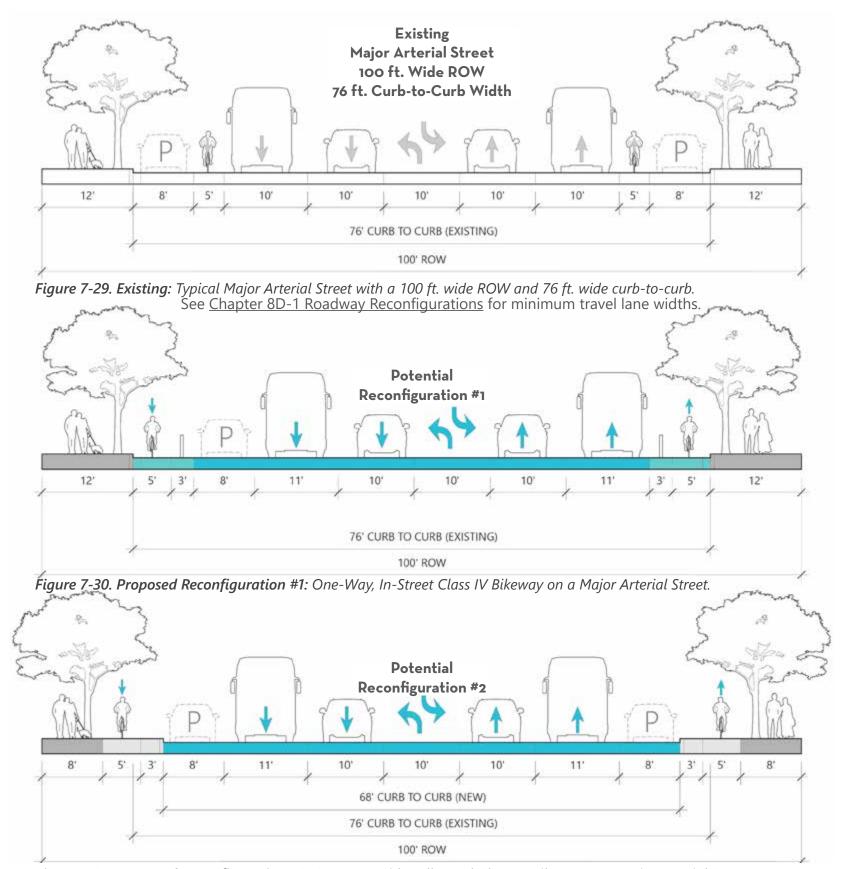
Proposed Reconfiguration #2: One-Way, Sidewalk-Level Class IV Bikeway on a Major Arterial Street.
